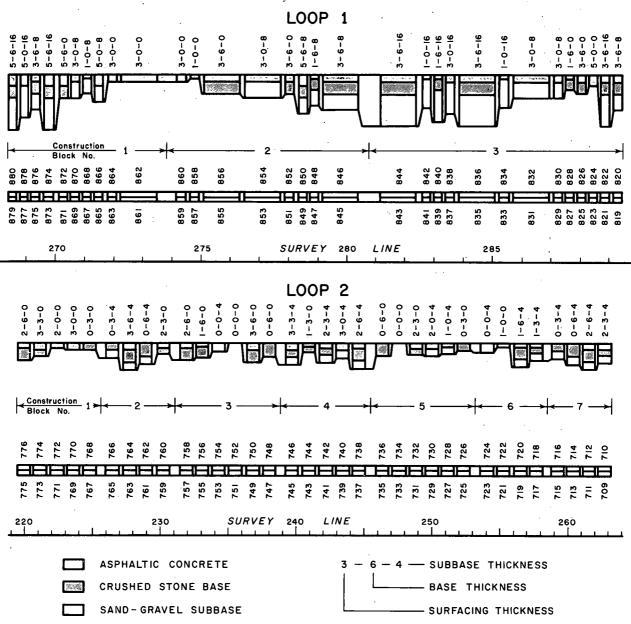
Layout of flexible tangent, Loops 1 and 2.
